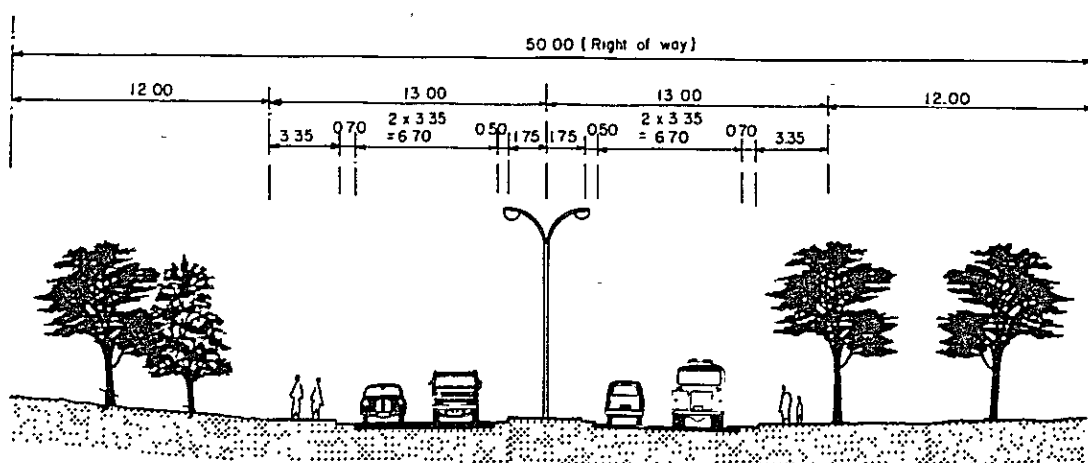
TYPICAL CROSS SECTION OF VIA MARTIN SOSA EXTENSION
